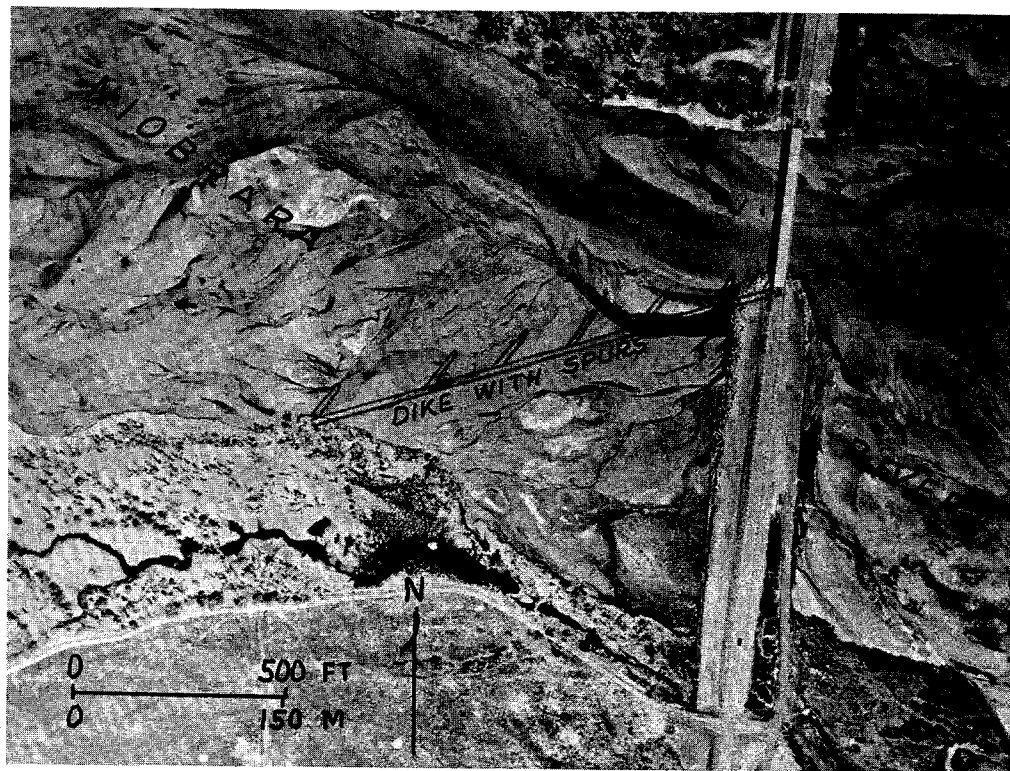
Aerial photograph of Niobrara River at US-183 crossing, in 1956. Layout of dike with spurs, built in 1958, has been added. (From Nebraska Dept. of Roads.)
